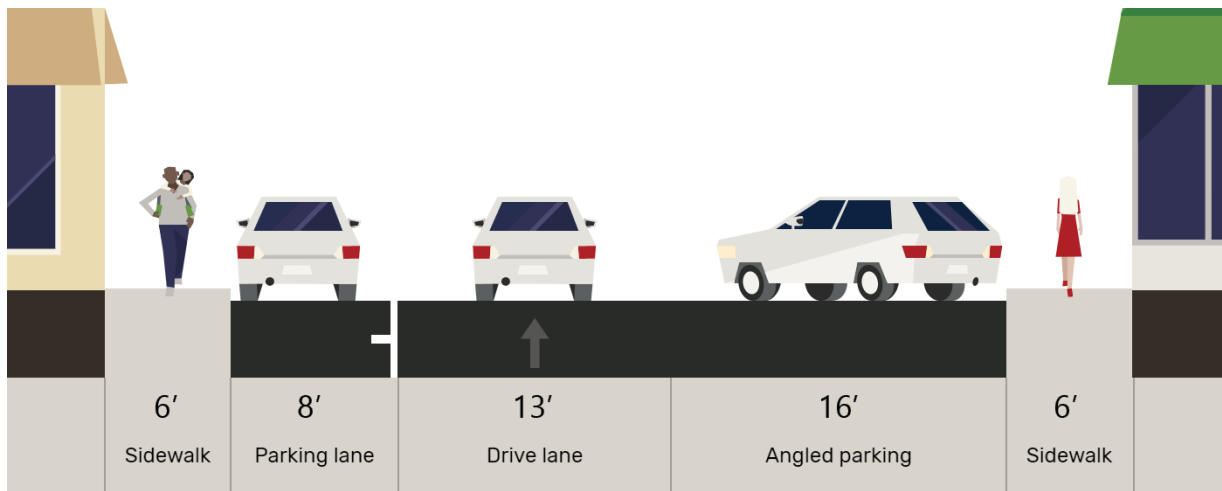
Alternative (R-7a) Configuration 2: Parallel Parking with Angled Parking (No Bike Lane)
